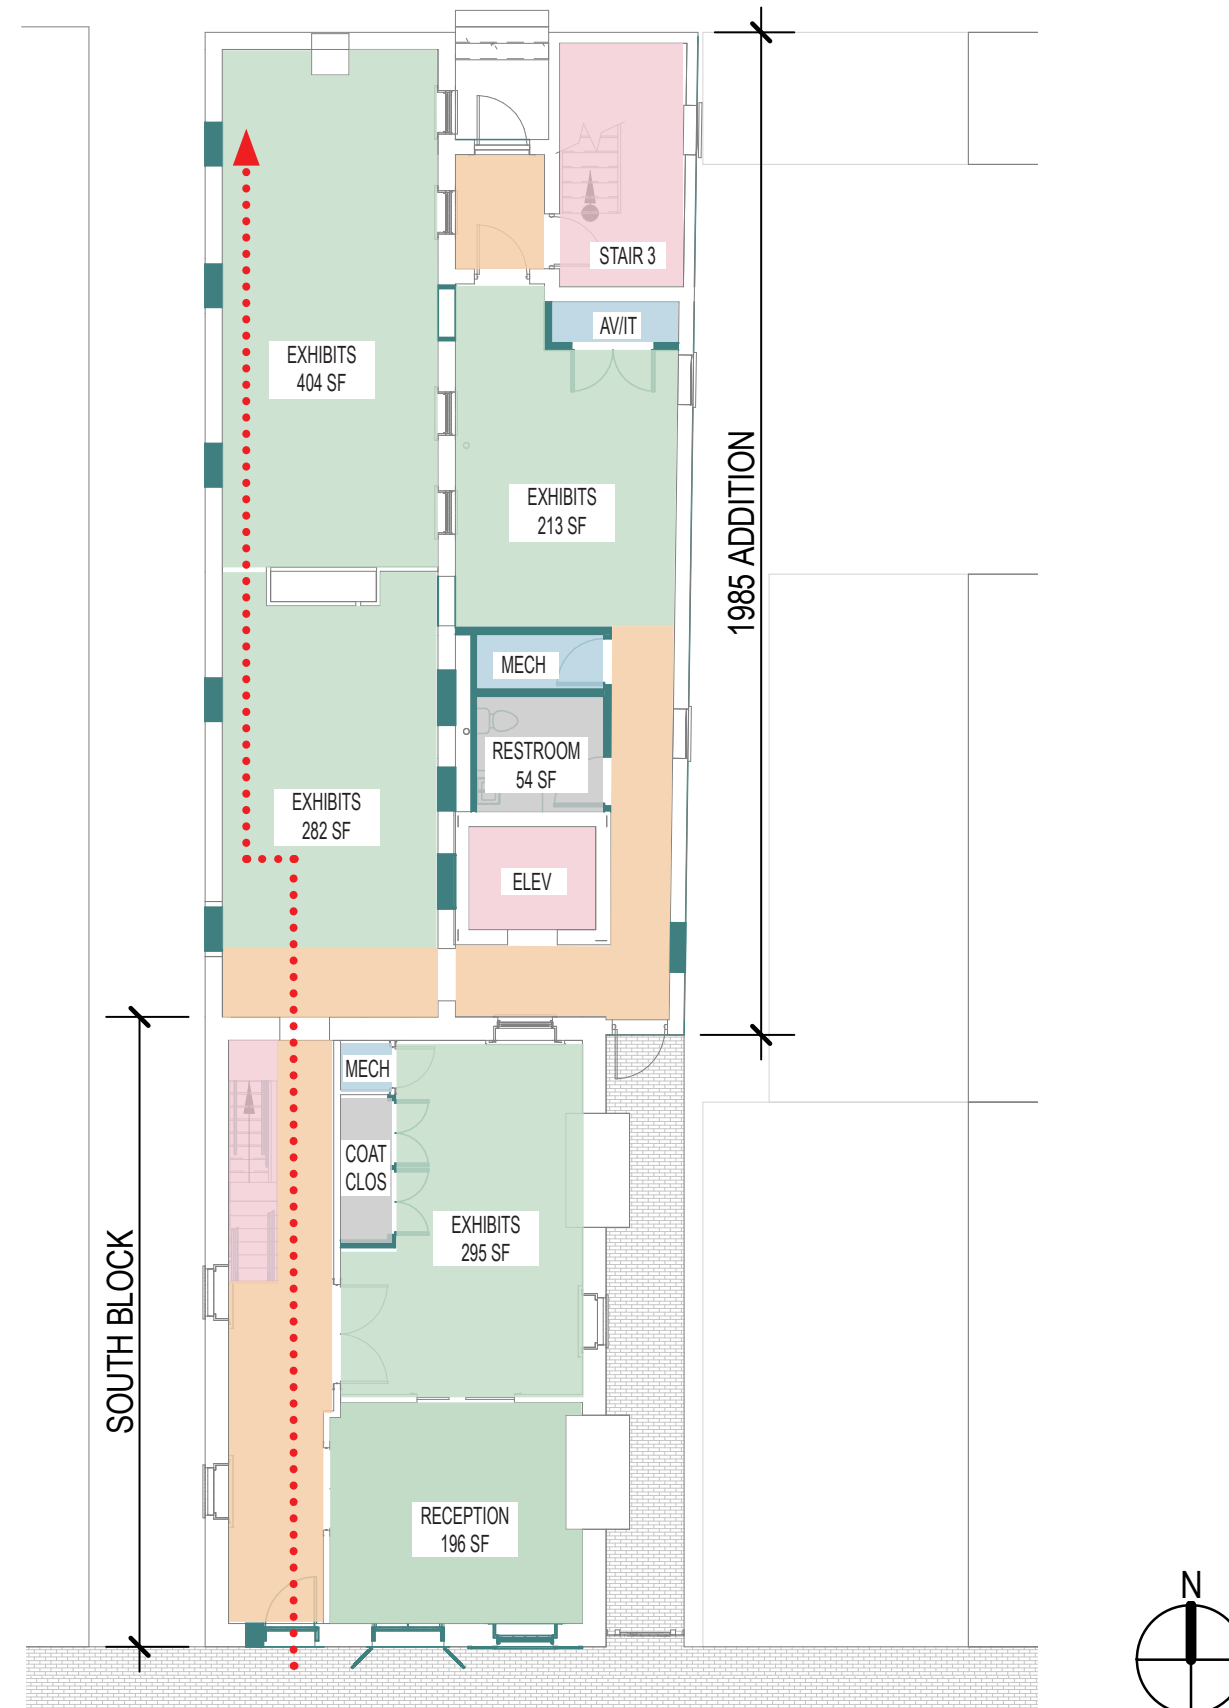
Diagram Showing Opened Up Floor Plan and Improved Visitor Flow on First Floor
